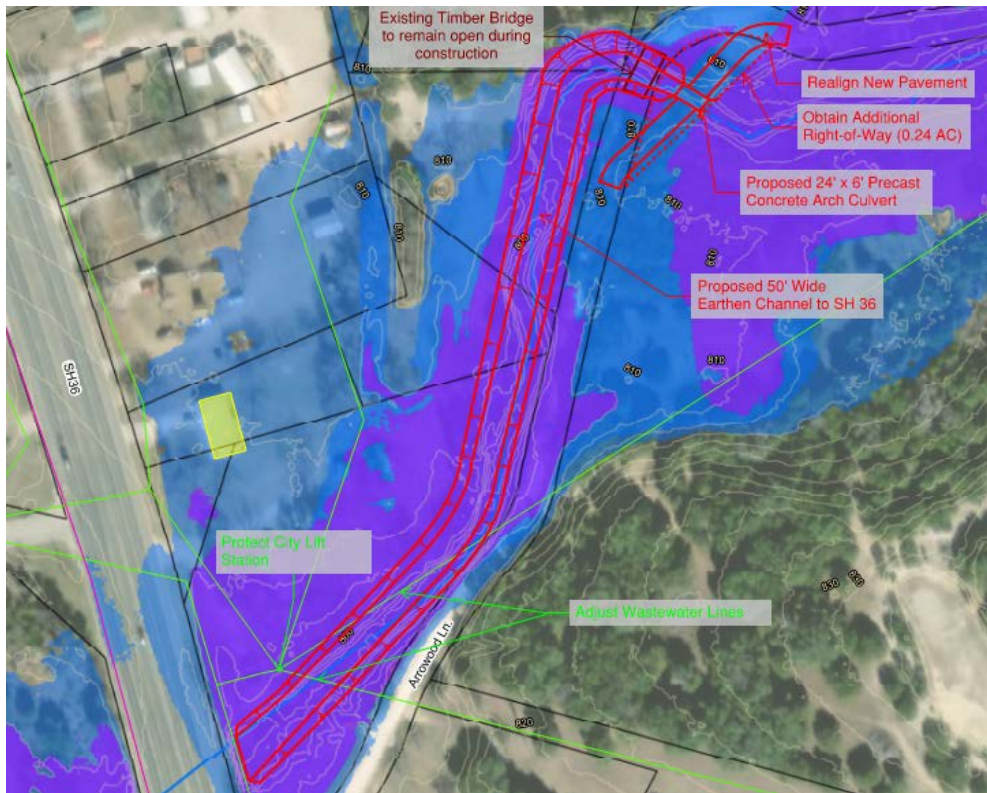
A: Arrowood Lane Culvert and Channel – 10% ACE
